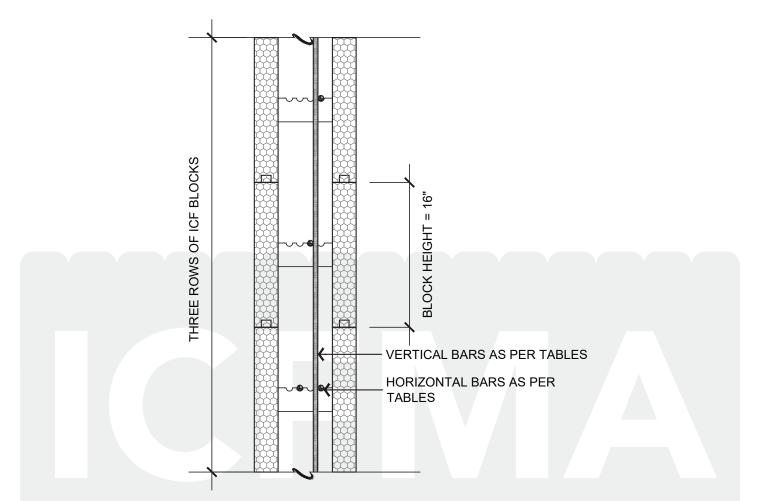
Above Grade Wall Reinforcing Placement for 12" Thick Walls.
